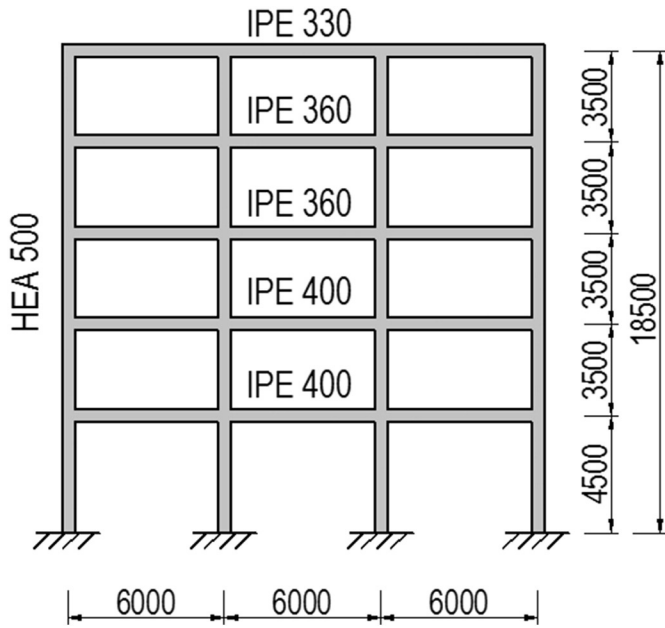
Case study building geometry with dimensions in mm and section profiles.
